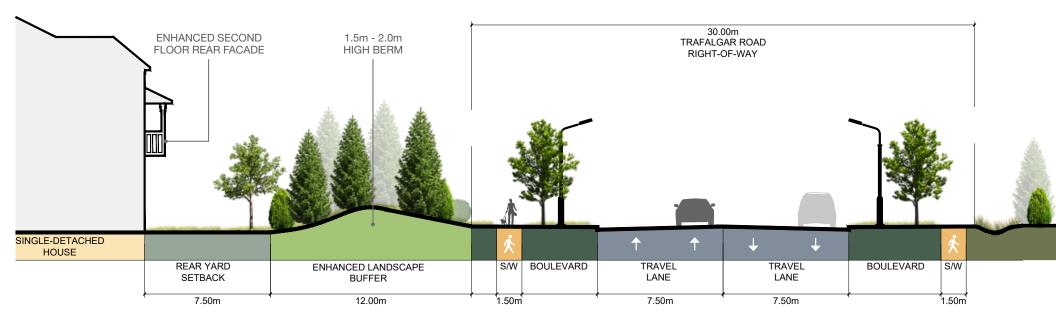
E-E' Enhanced Landscape Buffer for Dwellings Backing onto Trafalgar Road.
